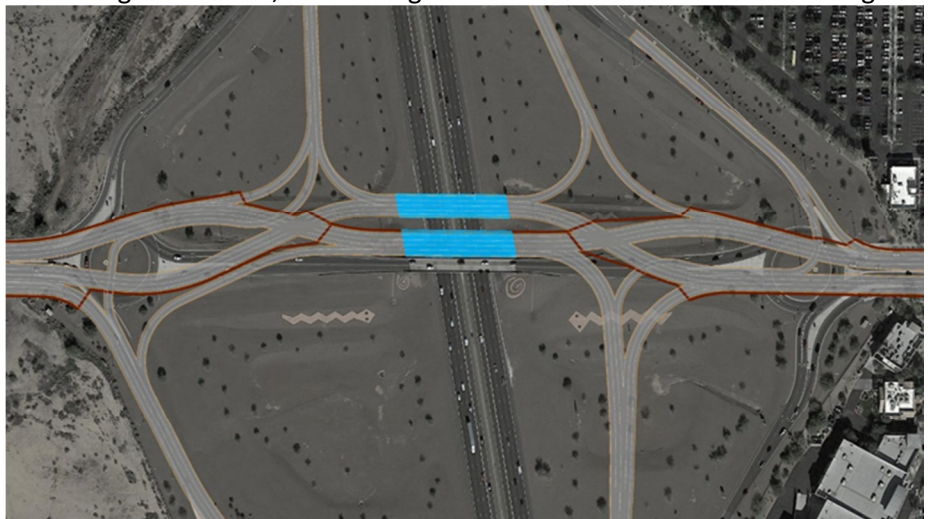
I-17 and Happy Valley Road Proposed DDI Configuration, Arizona
